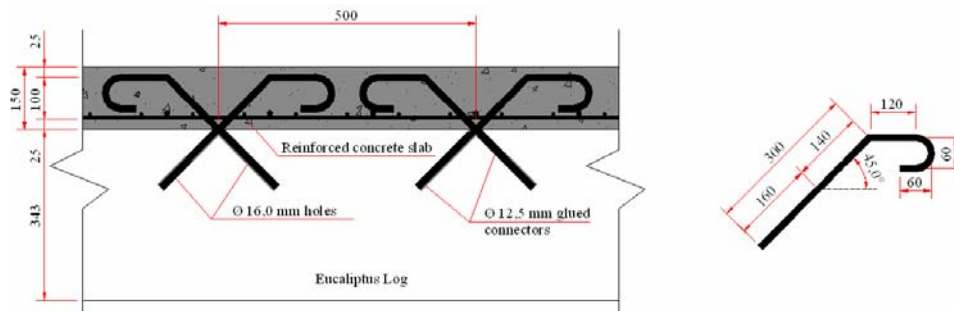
Connectors anchorage details (dimension in millimeters)
